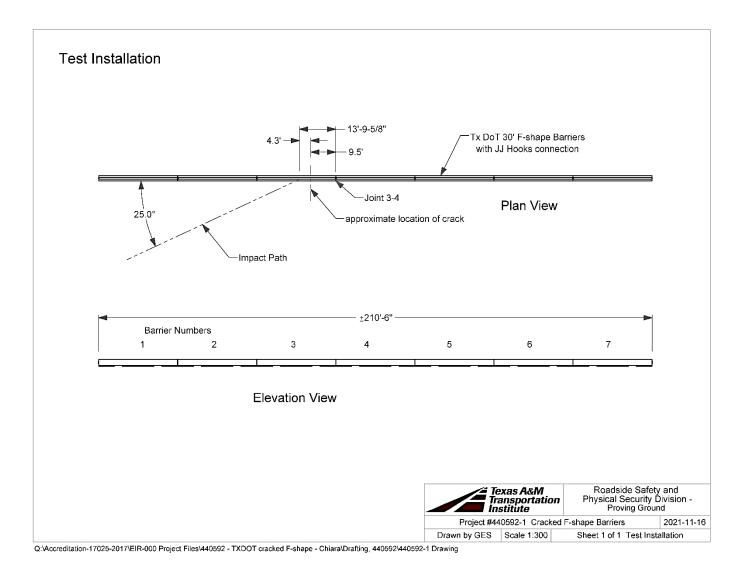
Details on Damaged Portable Concrete Barriers.
